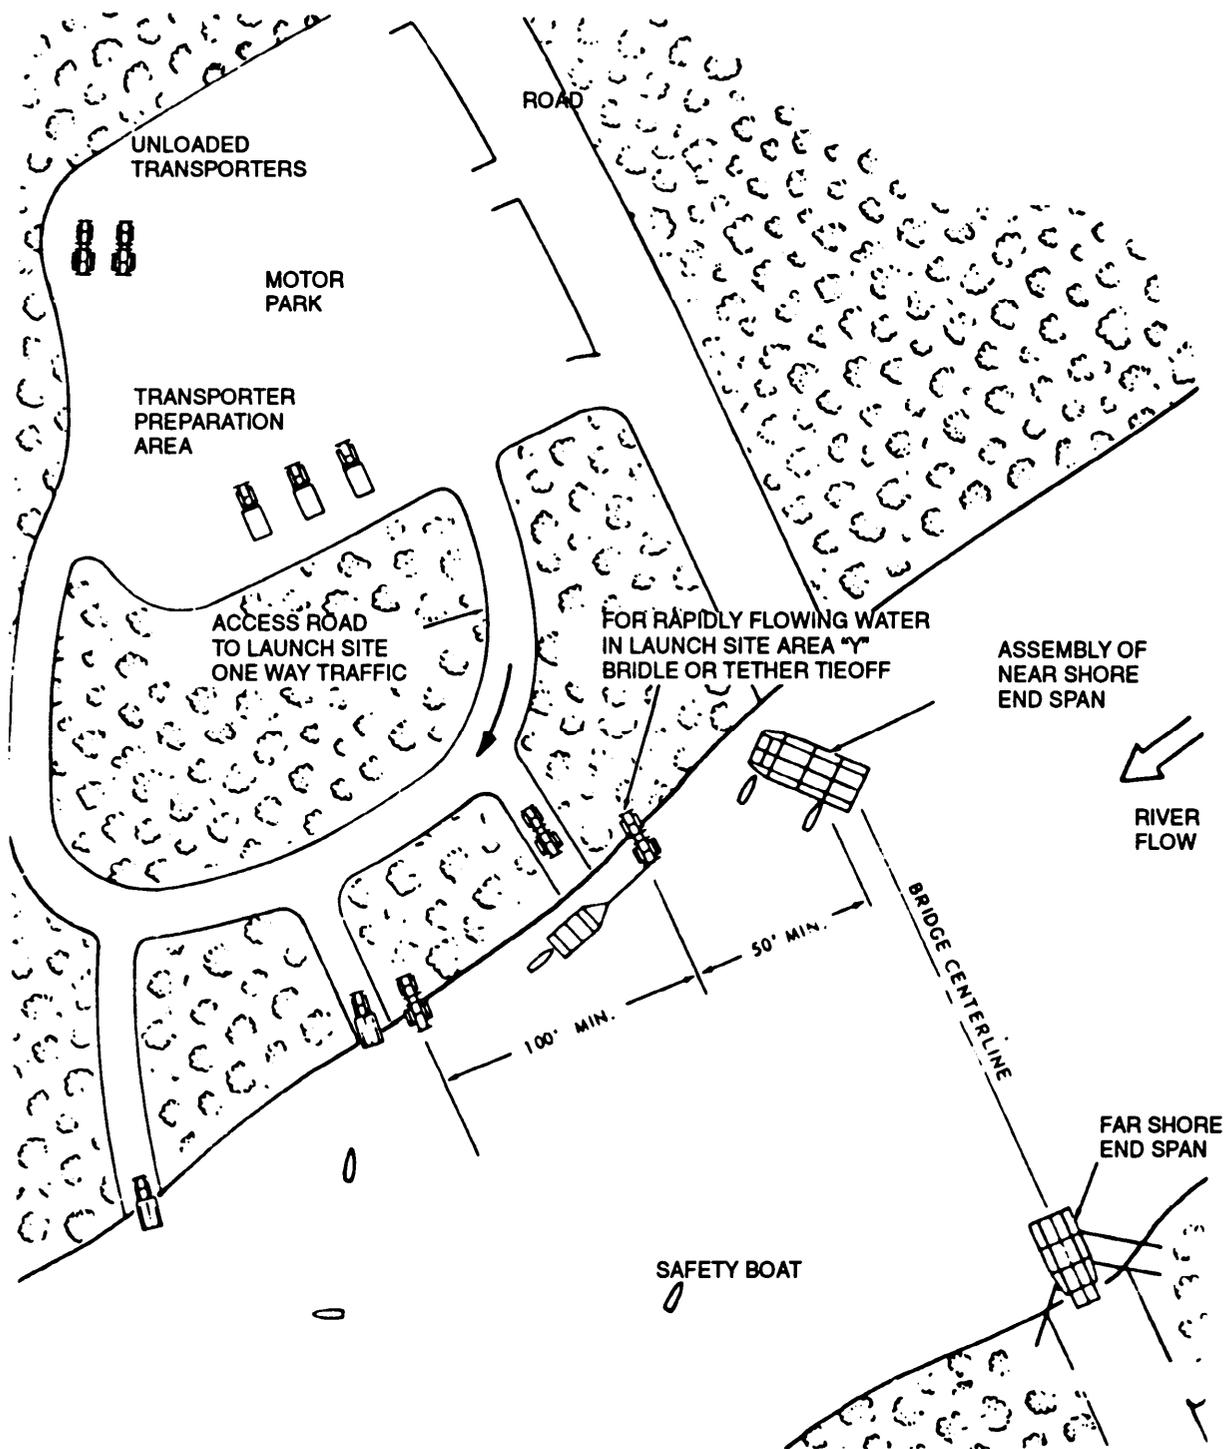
Bridge Assembly Site Layout for Multilaunch Site (Successive Bay Assembly).
